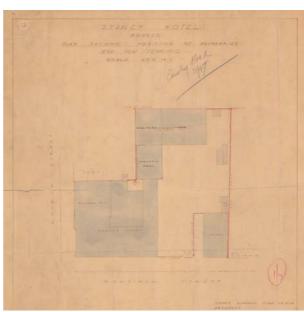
Site plan with footprint of the building. [Source: Architectural drawing for Sydney Hotel Mudgee, New South Wales, November 1947 . 2021, Museum of Applied Arts & Sciences
